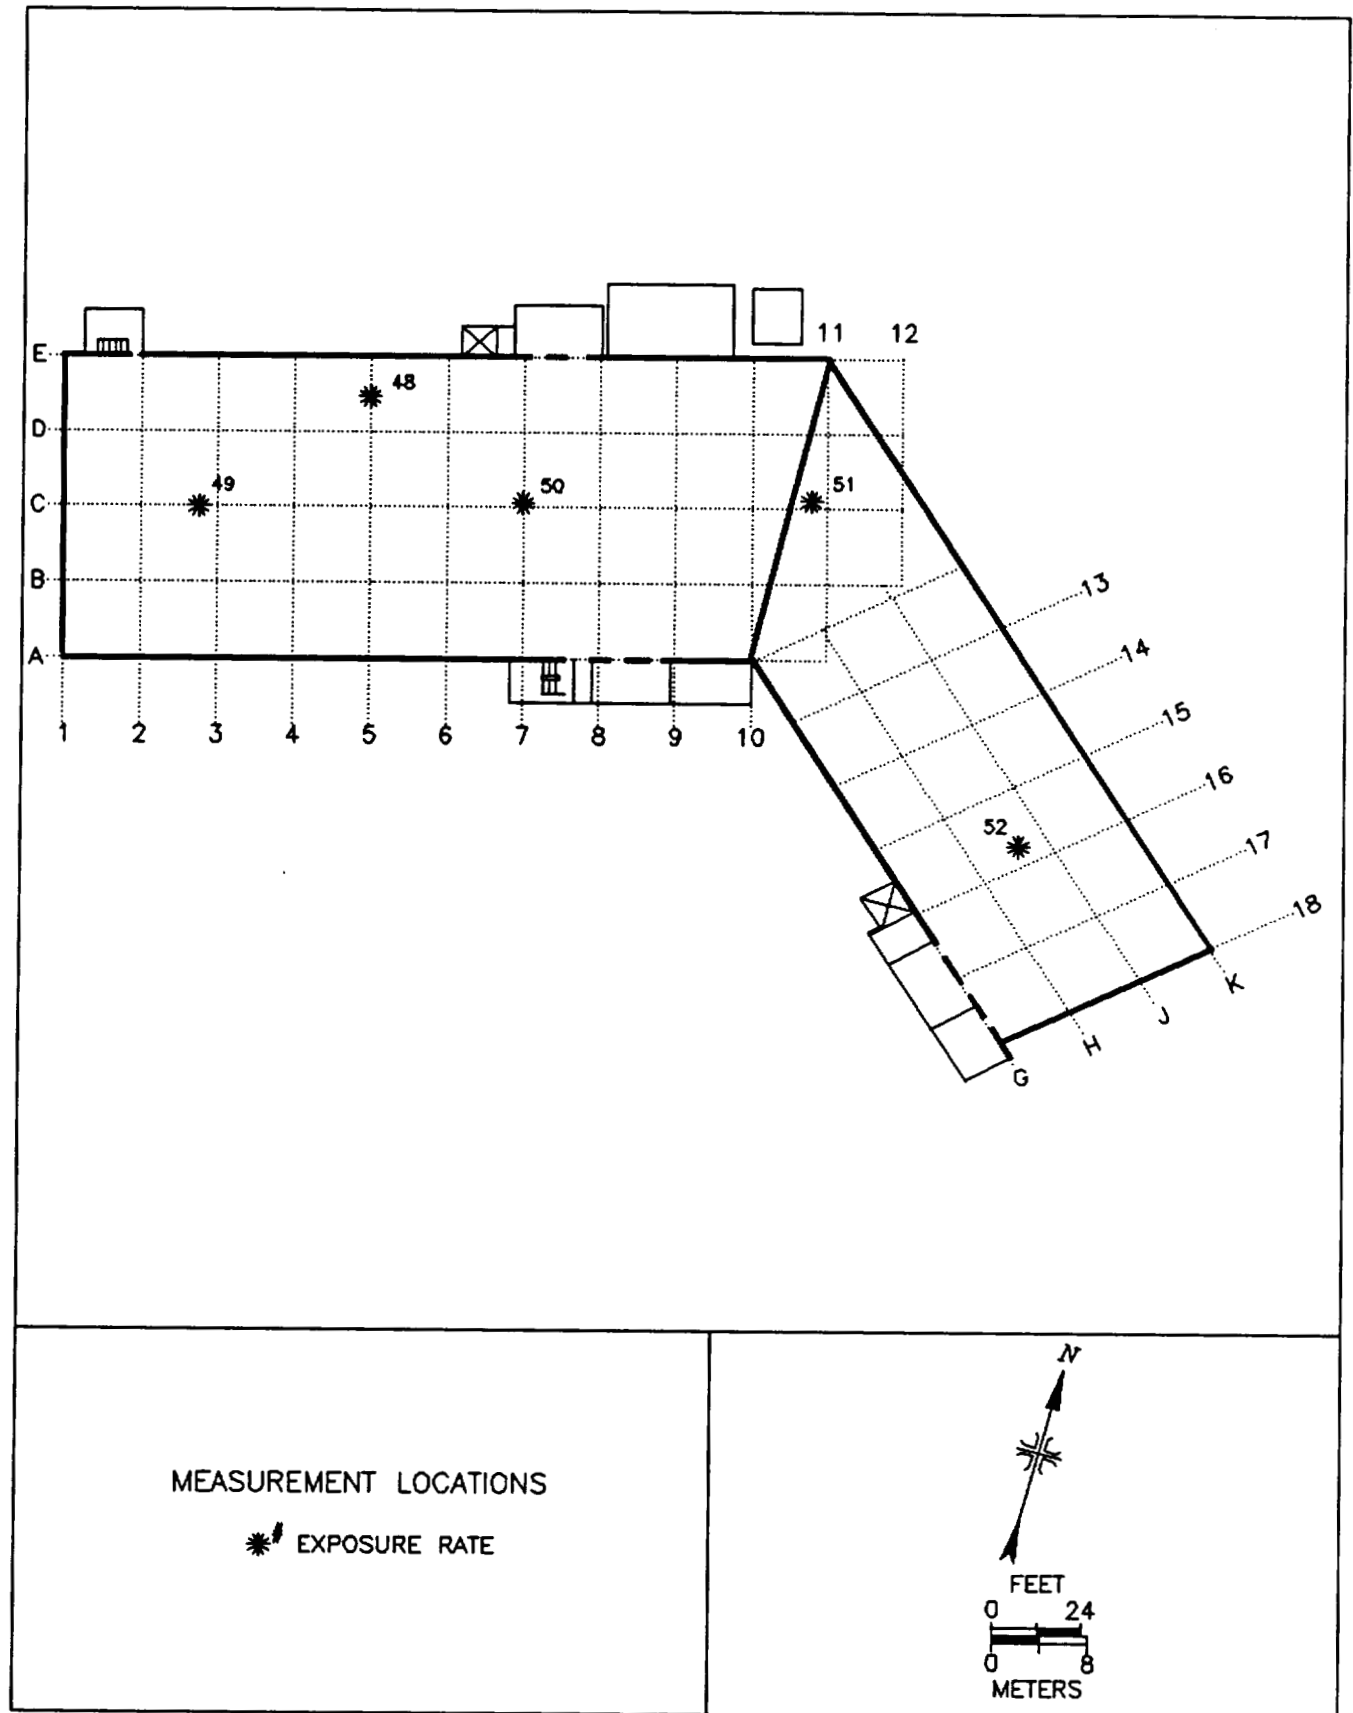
Building 8, Fourth Floor – Exposure Rate Measurement Locations
